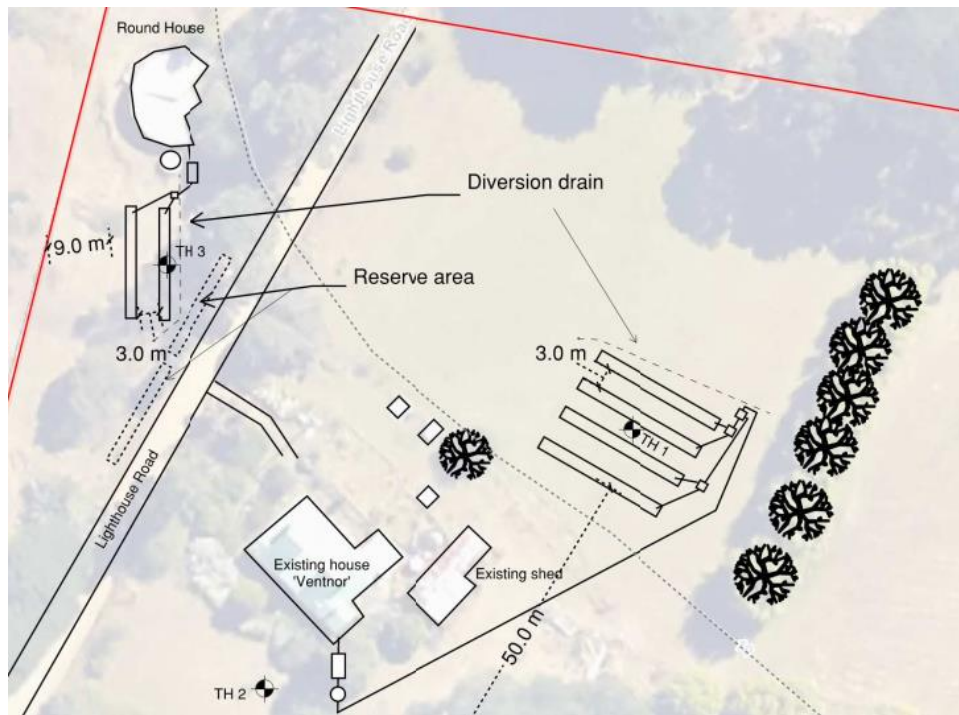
OSWW system site plan from DA-2018-59 (GES 2018)
